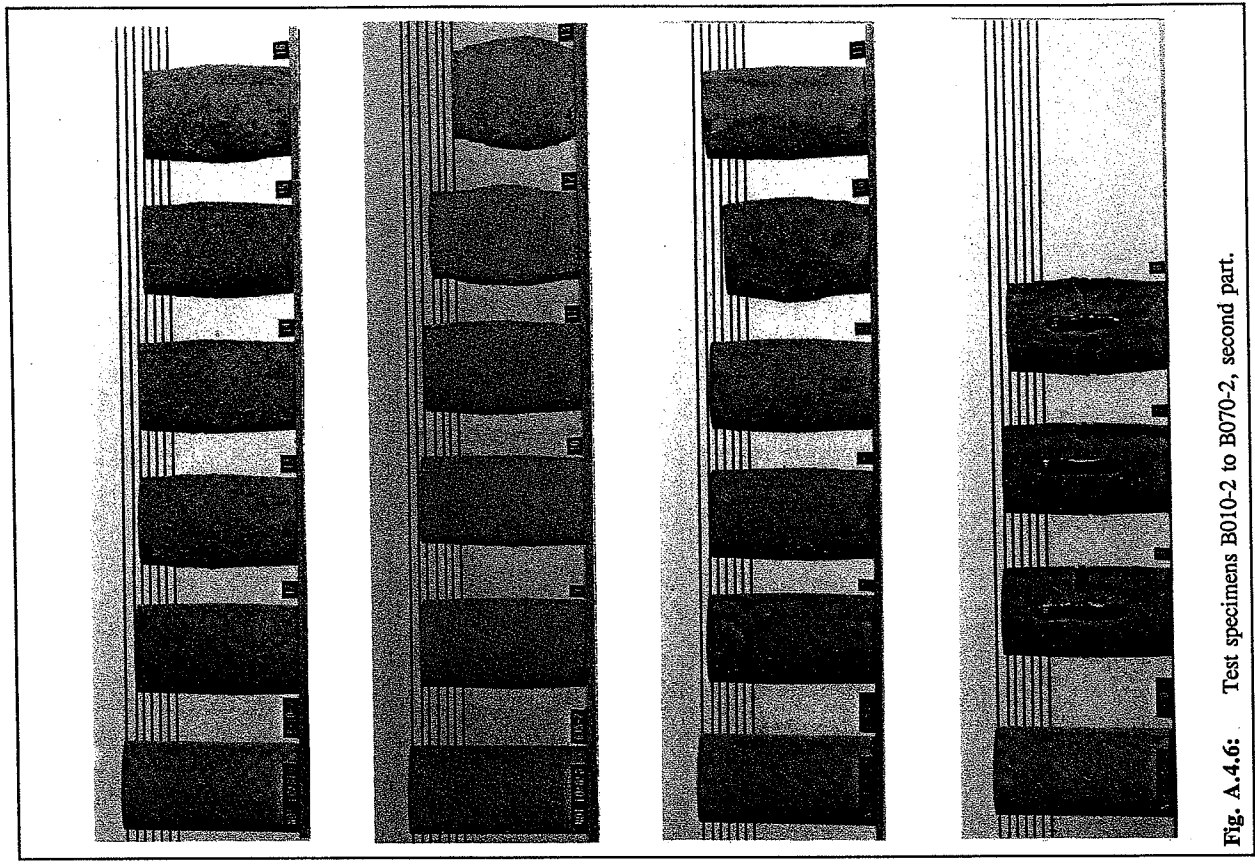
Test specimens B010-2 to B070-2, second part.
